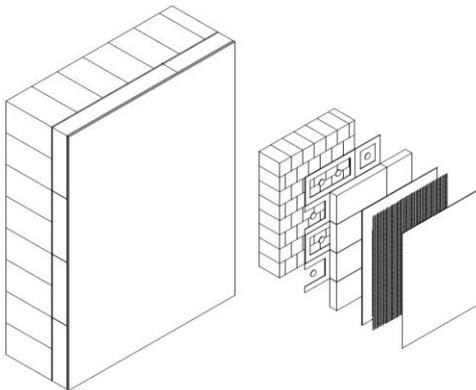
Layered model of an Exterior insulation and finish system (EIFS) consisting of: Walling, Bonding, Insulation, Reinforcement and plaster
